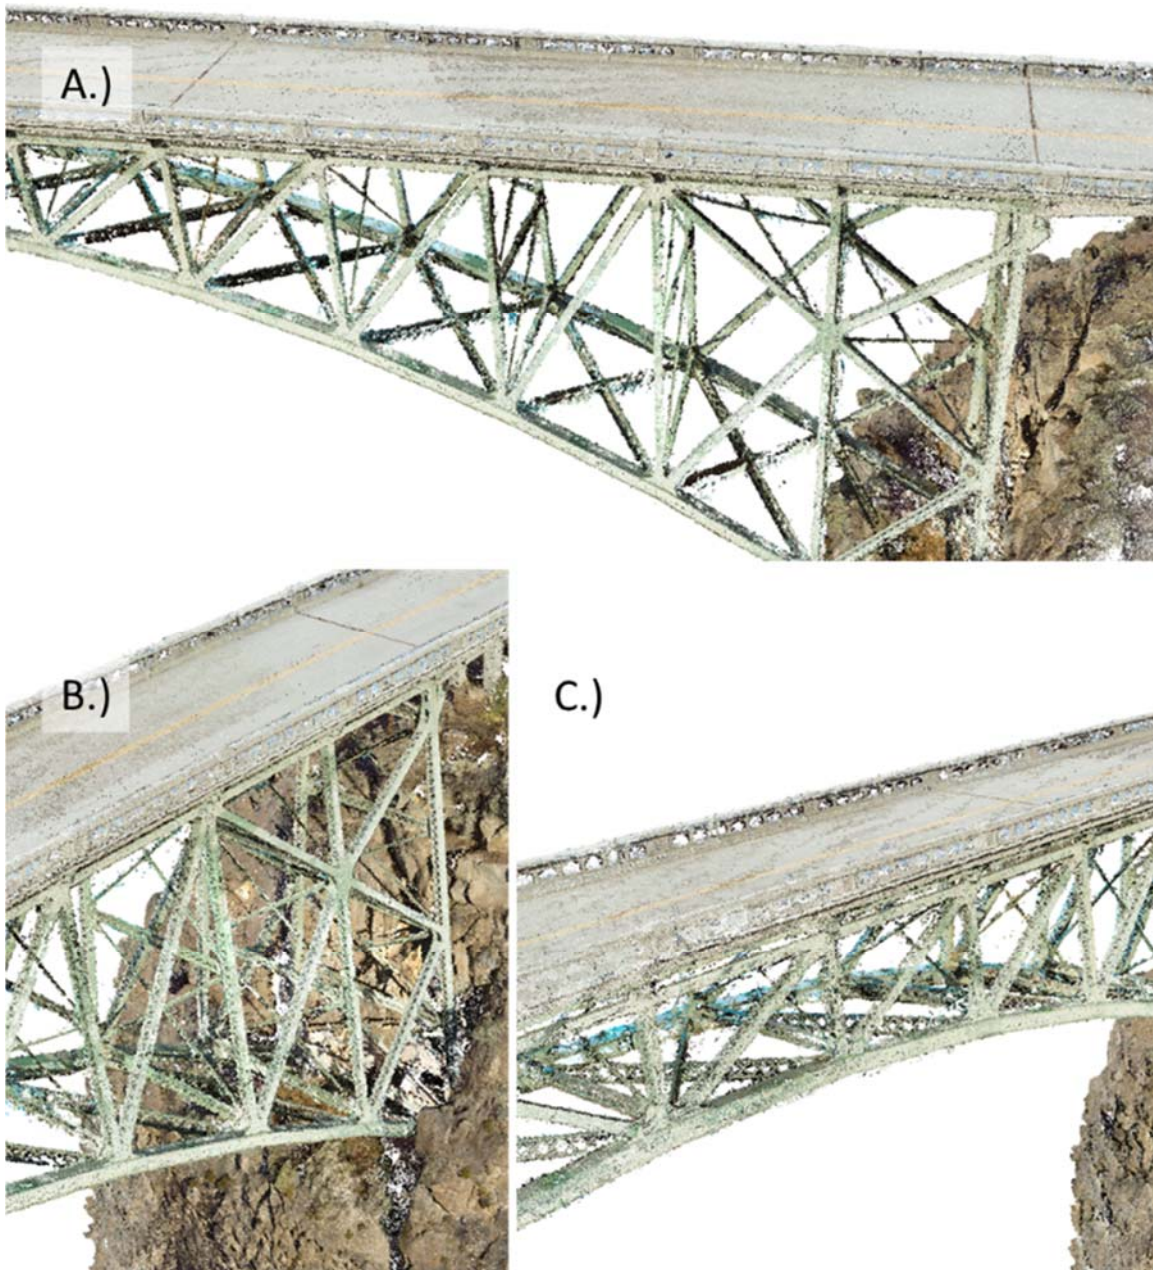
A.-C.) Detailed views of the Crooked River Bridge point cloud
